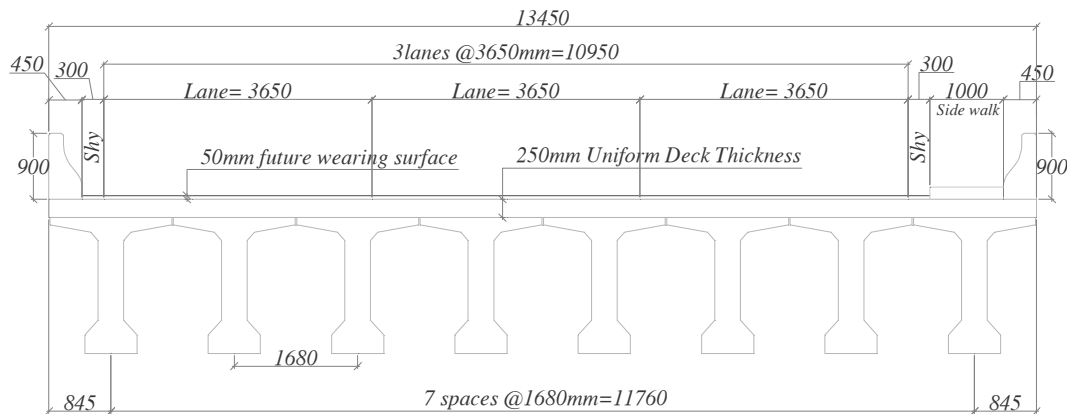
Bridge Cross-Section (all dimensions are in mm)
